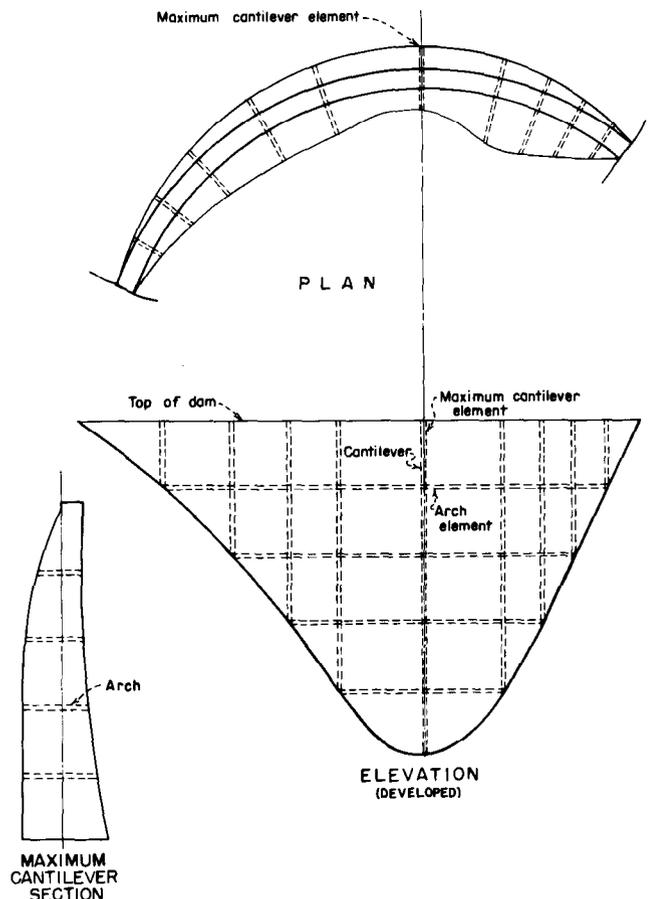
Plan, profile, and section of a nonsymmetrical arch dam.—288-D-2681
